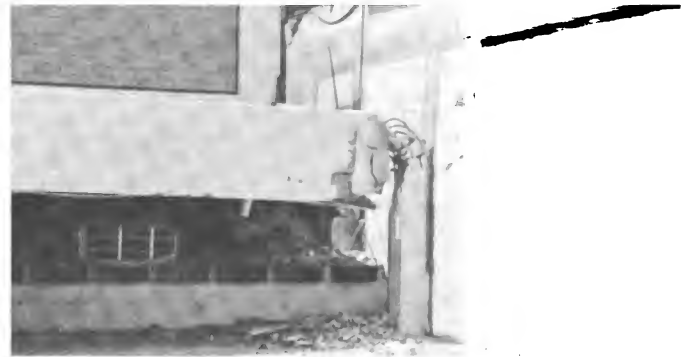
Olive View Hospital, psychiatric unit. View of northeast corner where the building separated from north retaining wall. Note cracks in wall and position of beam at left relative to its original position next to retaining wall.
